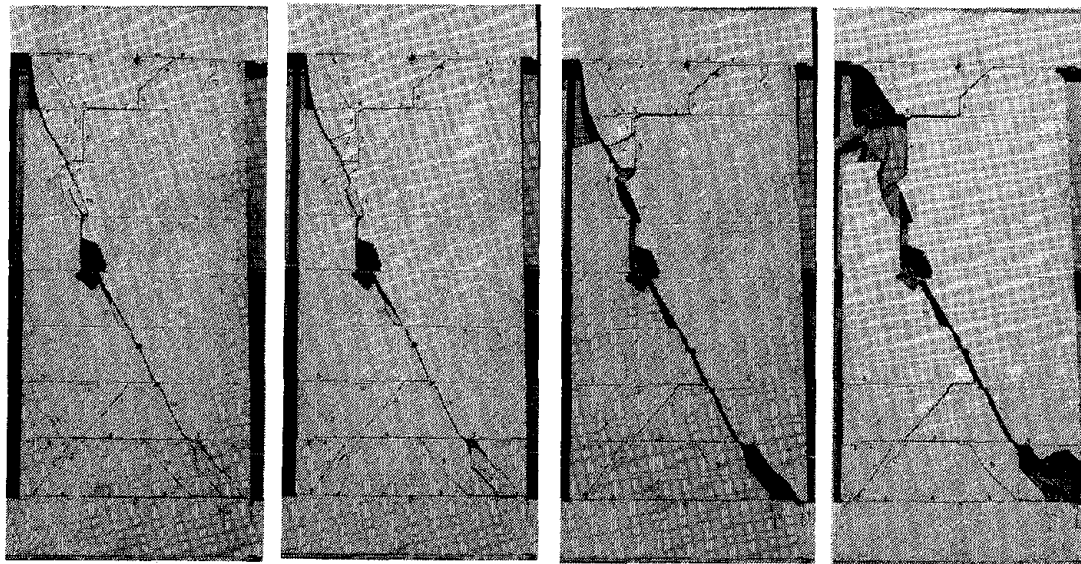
SUCCESSIVE CRACK FORMATION TEST 3. (RIGHT SIDE PIER)
